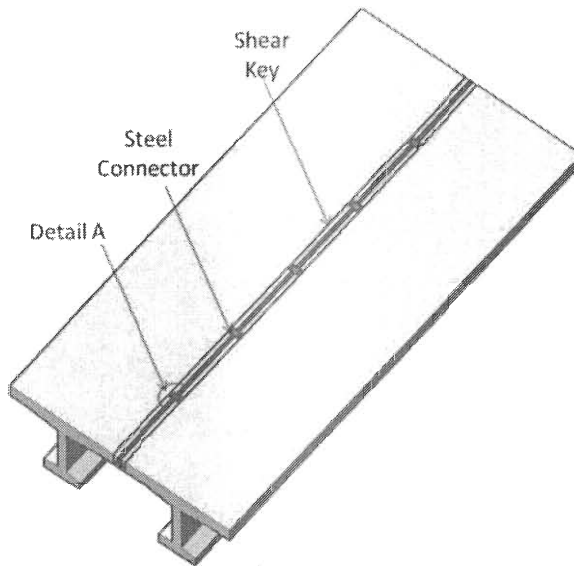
Common Shear Transfer Connection Detail 1 (Source: Oesterle and Elremaily 2009)
